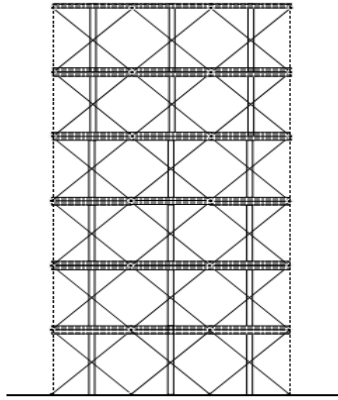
A Planar Shear Wall Modelled by Braced Wide Column Analogy
